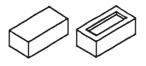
Concrete and calcium silicate (sand-lime) brick.
